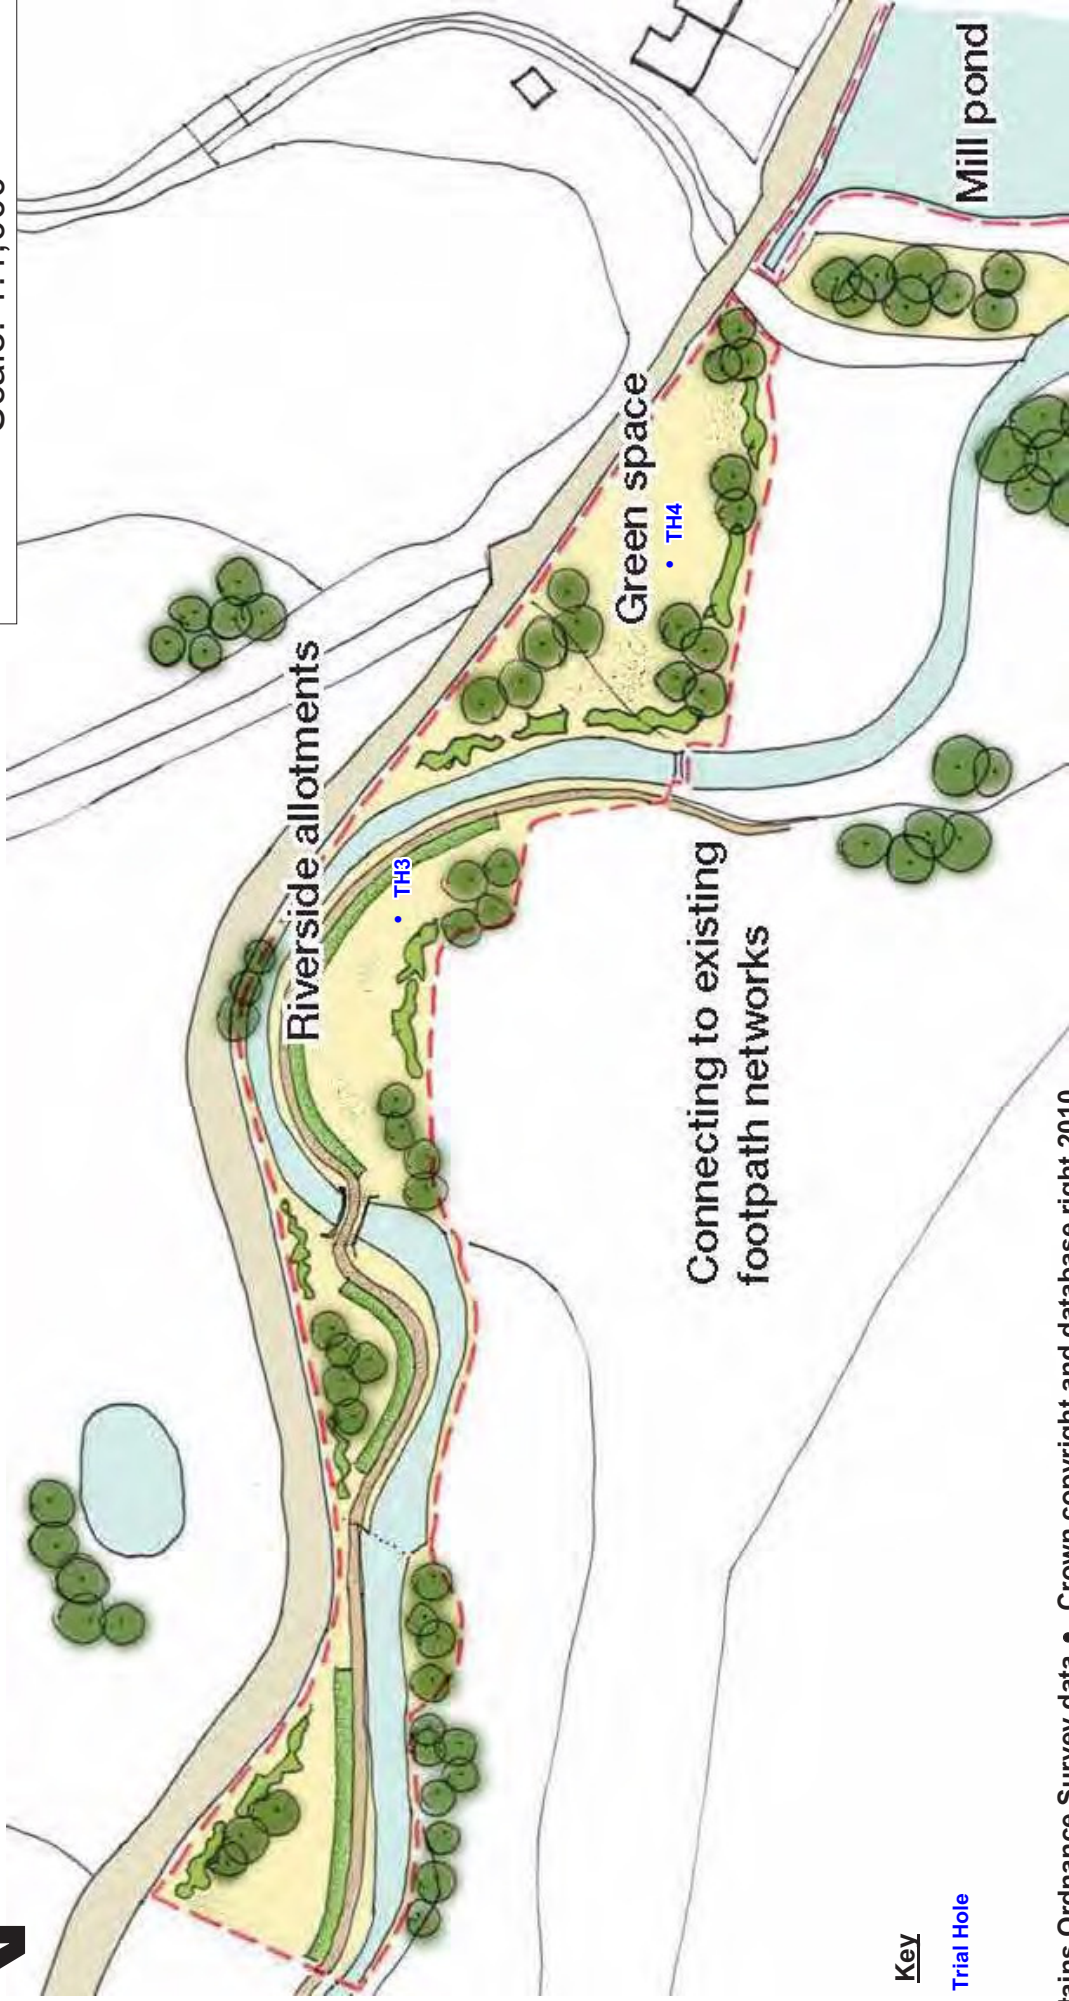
Area 4 Trial Hole Location Plan, Land at Longridge Road, Chipping
